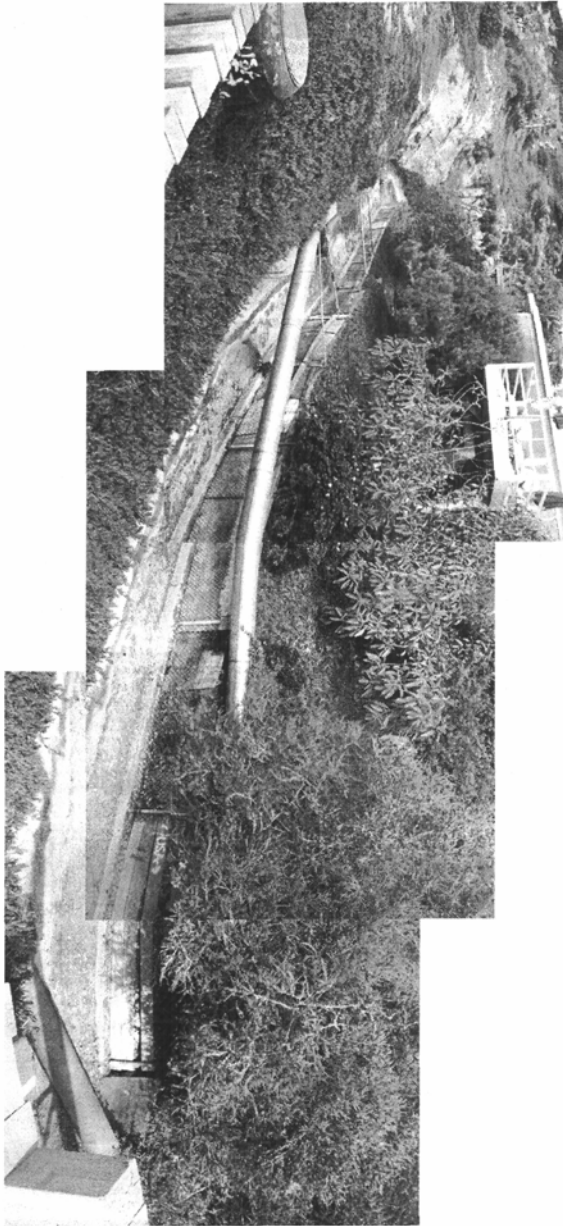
On Beach Trail looking at proposed wall location. Wall would be constructed behind channel on right side.
